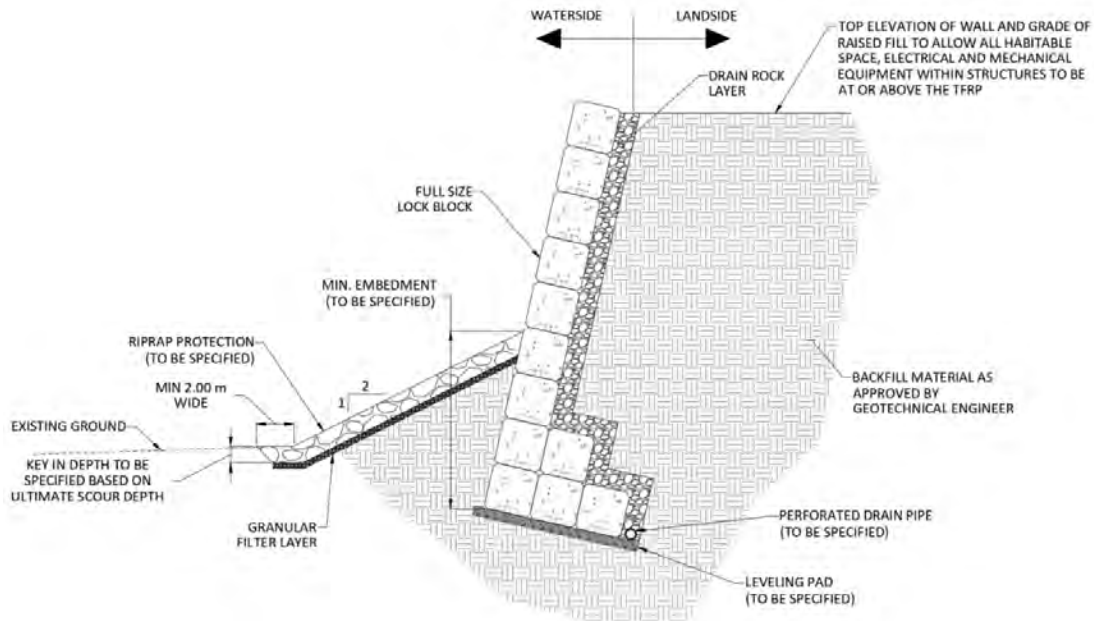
Conceptual Typical Section for Option 1 with MSE Wall
